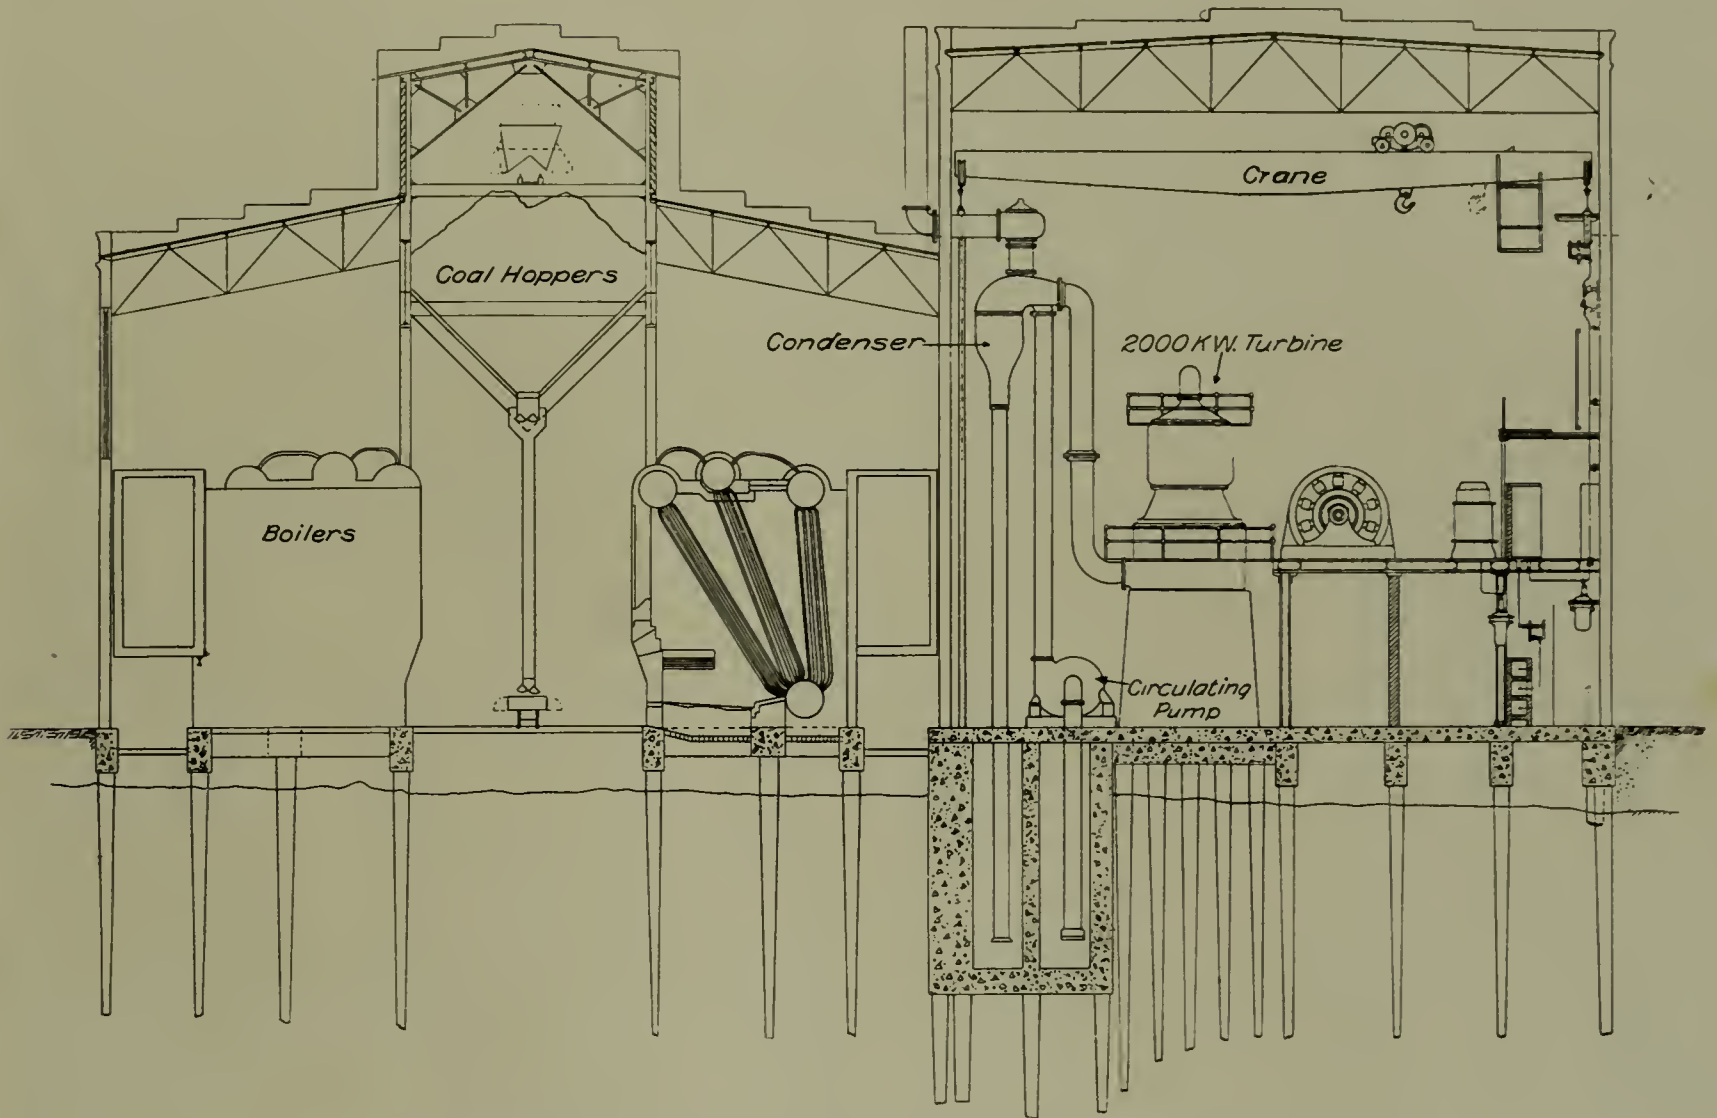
TRANSVERSE SECTION OF THE POWER HOUSE AT WESTVILLE, N. J.
